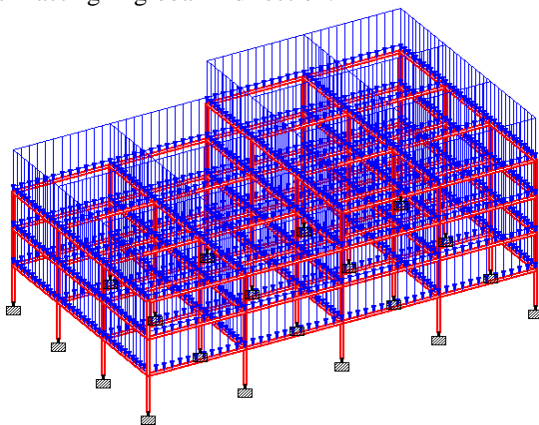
Gravity Loading on Structural Steel Frame for Pushover Analysis
